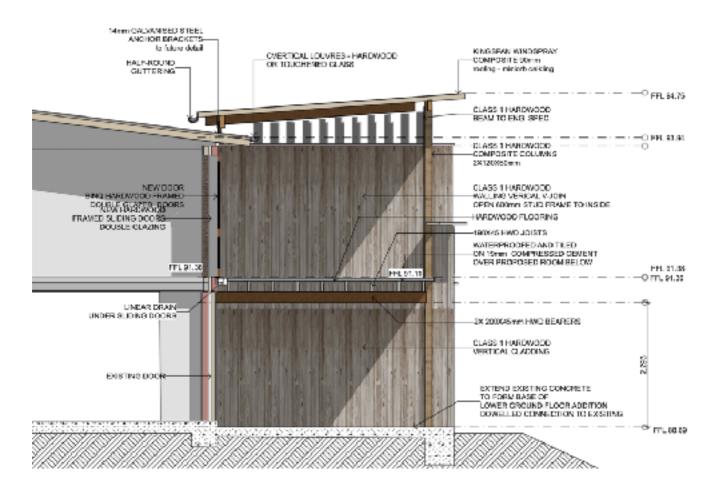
SECTION THROUGH PROPOSED COVERED VERANDAH
